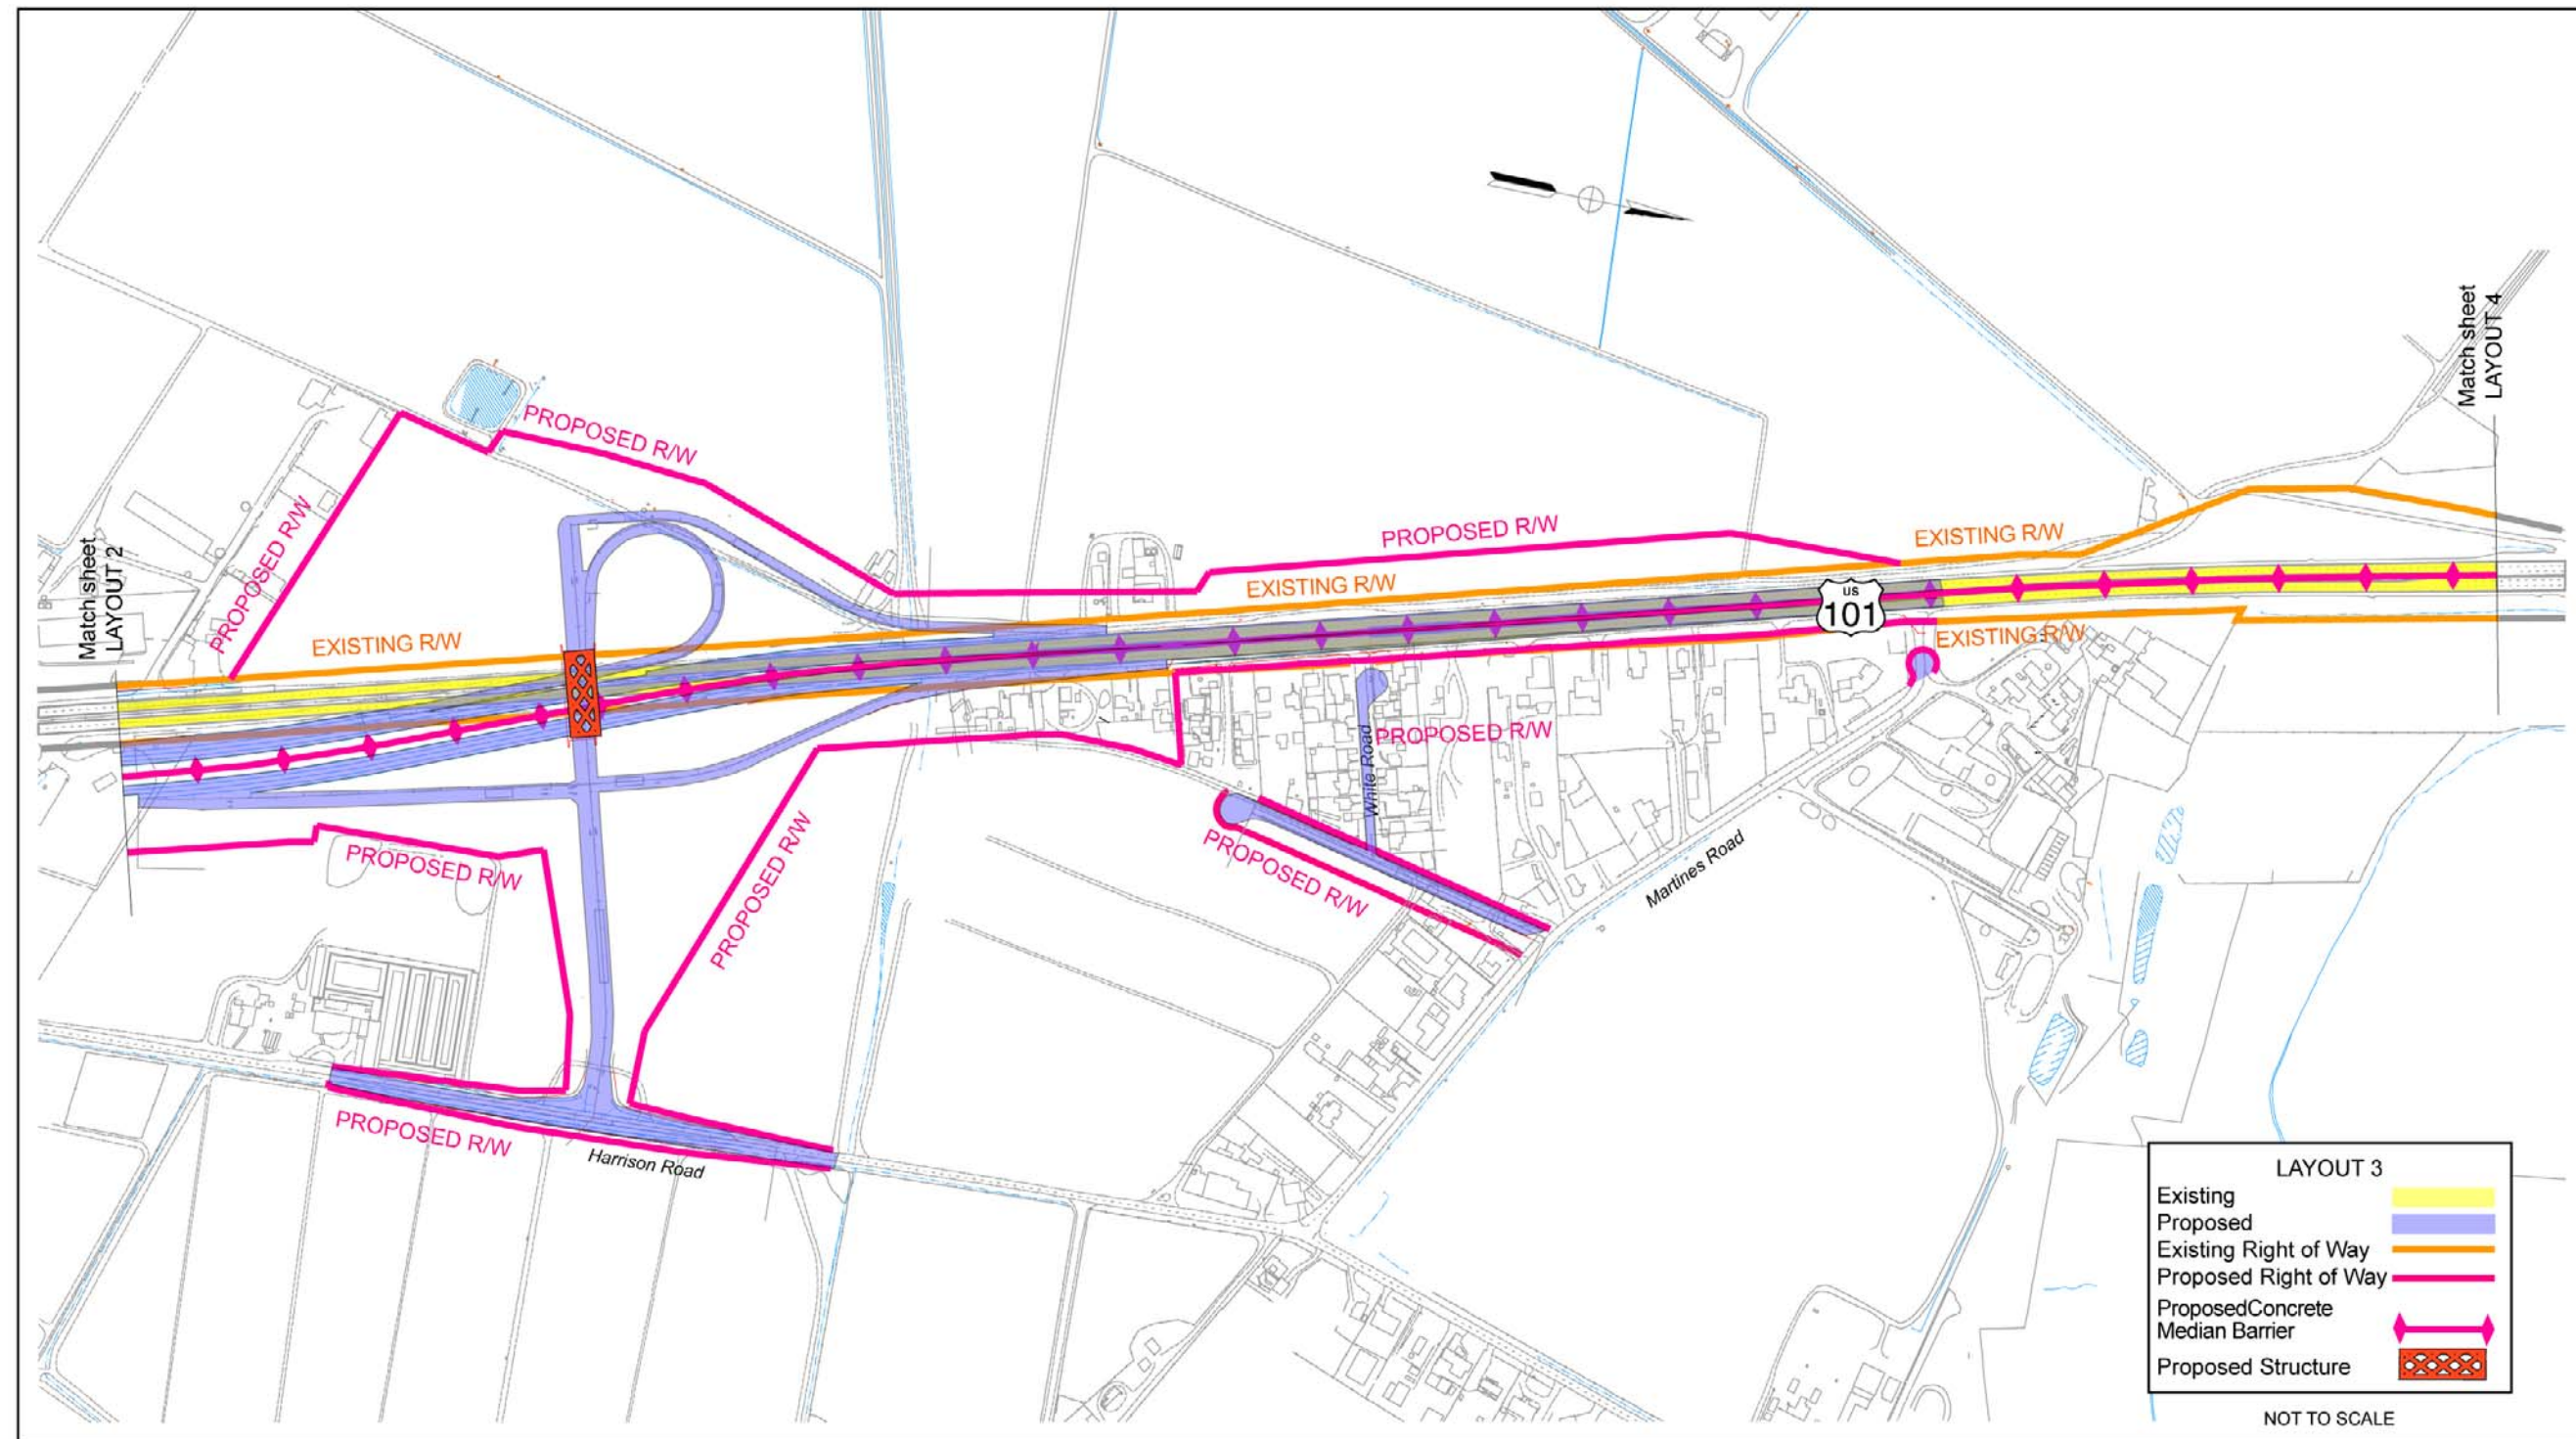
Build Alternative Design, Harrison/White Road Location
